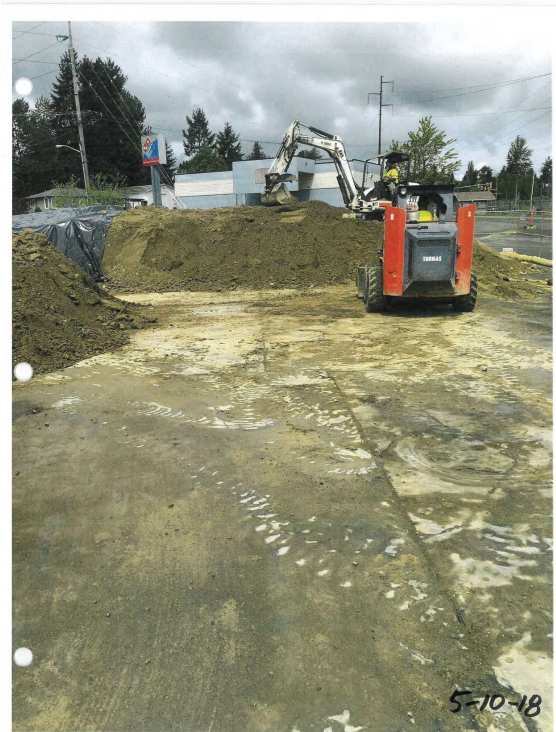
May 10, 2018. Stockpiling excavated soil at north end of pad. View N
